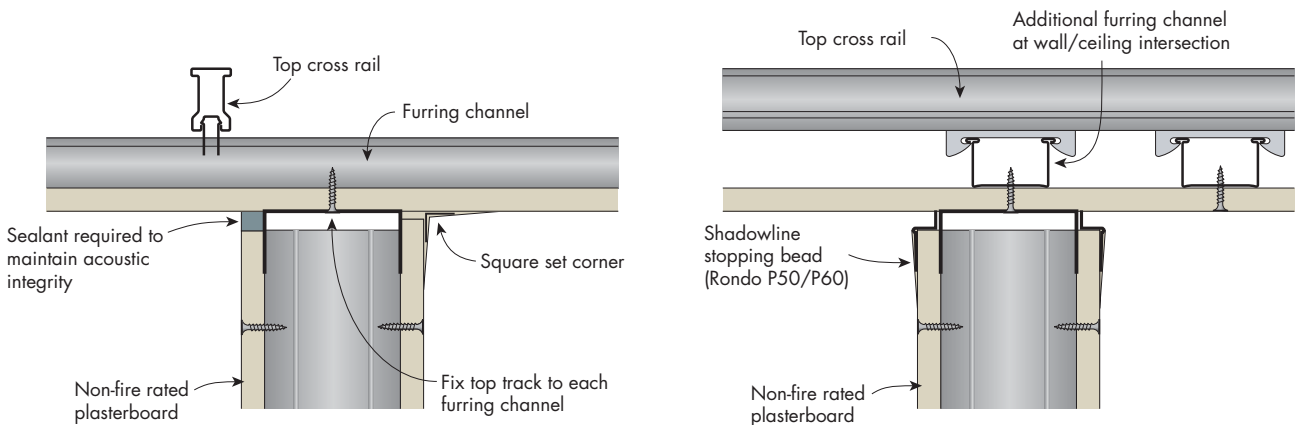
Wall Head to Suspended Ceiling Finishing Detail
